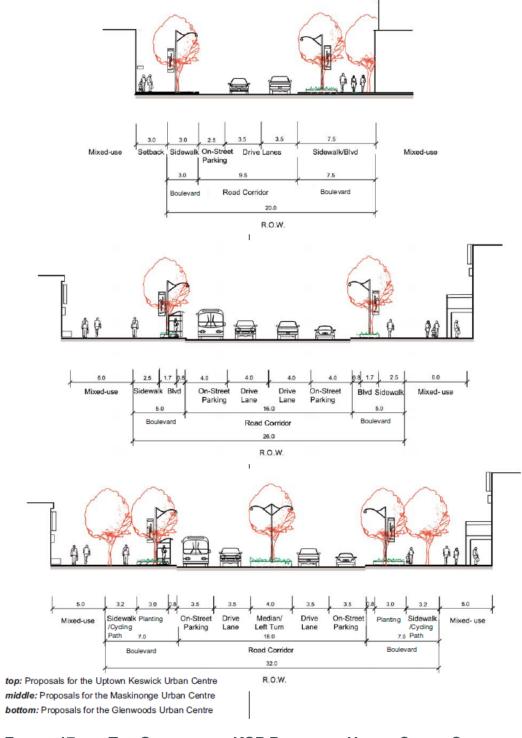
THE QUEENSWAY, KSP PROPOSED URBAN CROSS-SECTION
